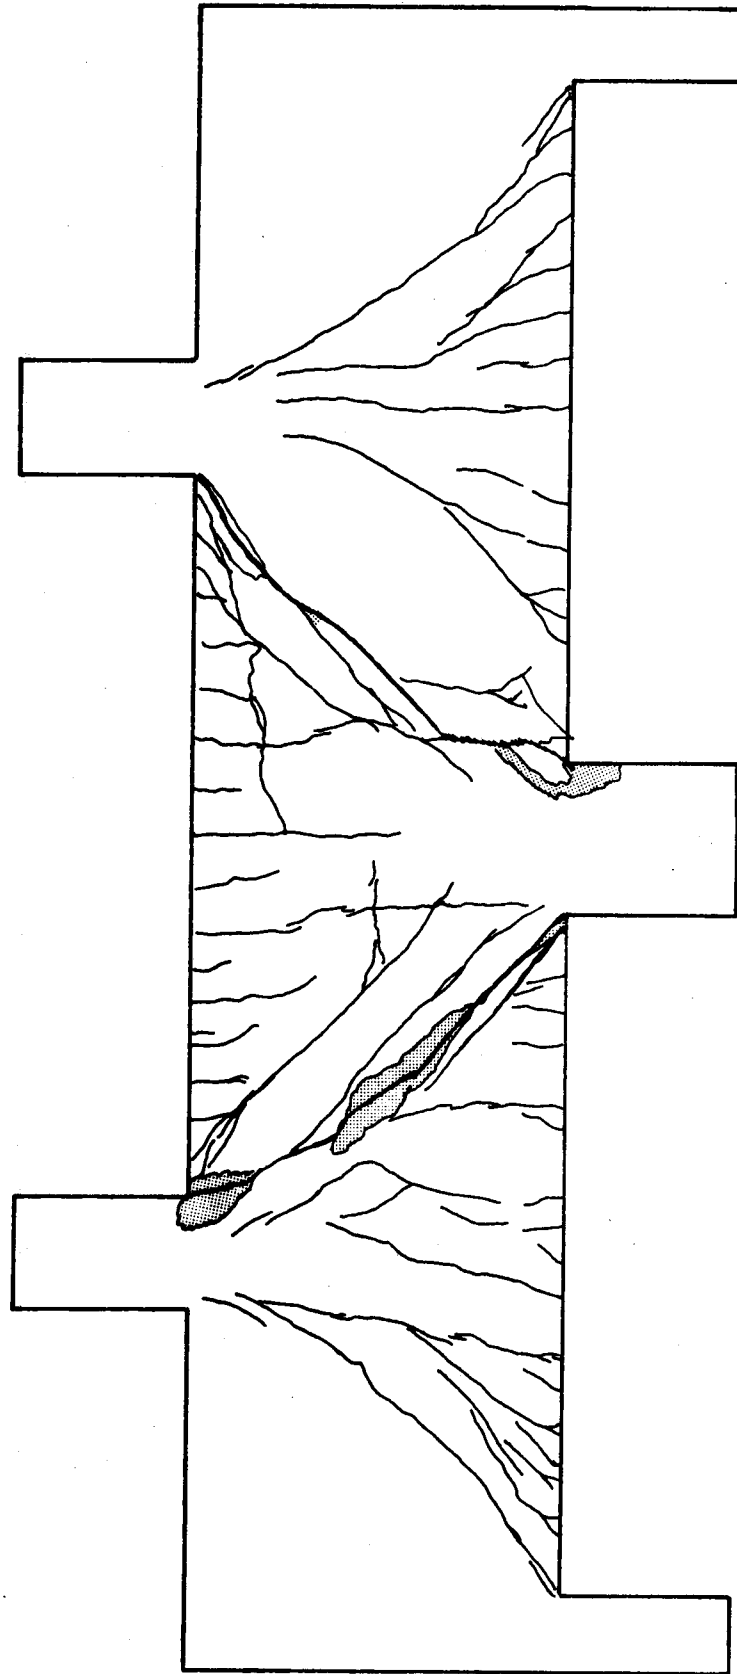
(a) Beam 6/1.0 Crack Pattern – West Face
